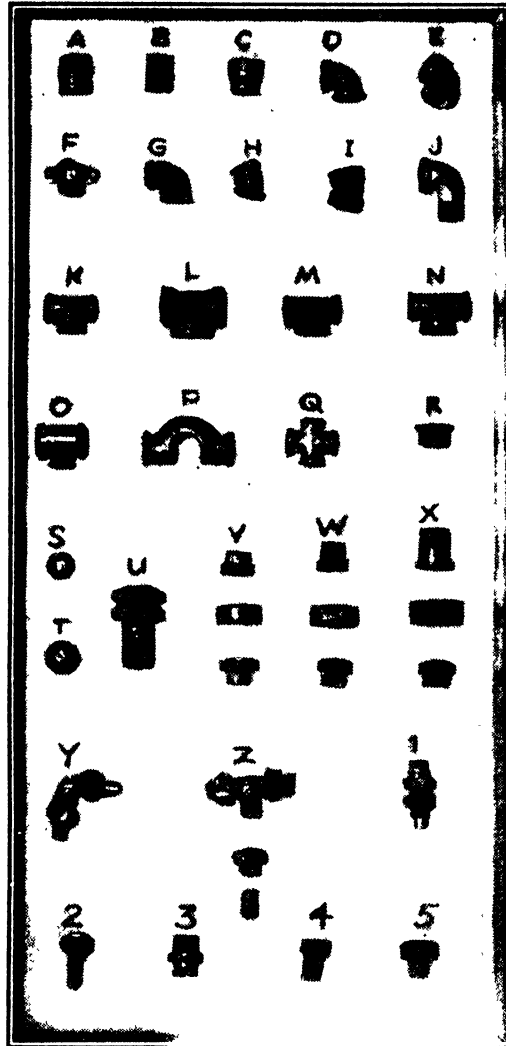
An assortment of fittings for steel pipe and copper tubing.
